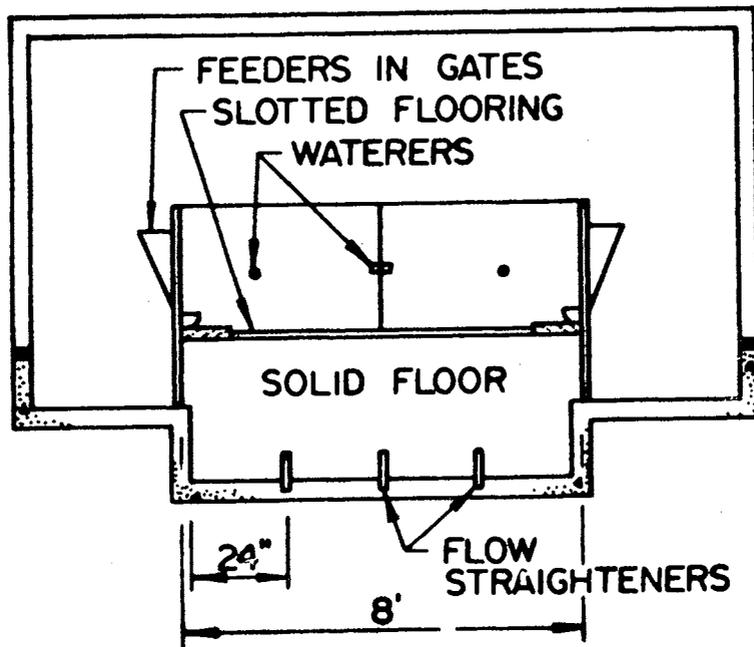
Wide rectangular gutter, with flow straighteners, under suspended flooring.
